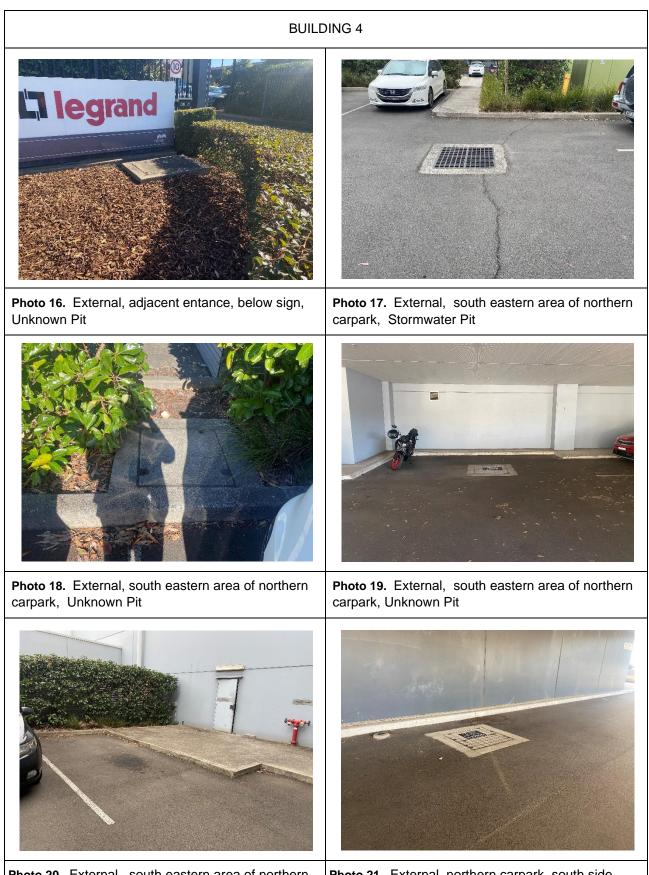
External, south eastern area of northern carpark infront of fire door, Unknown Pit
